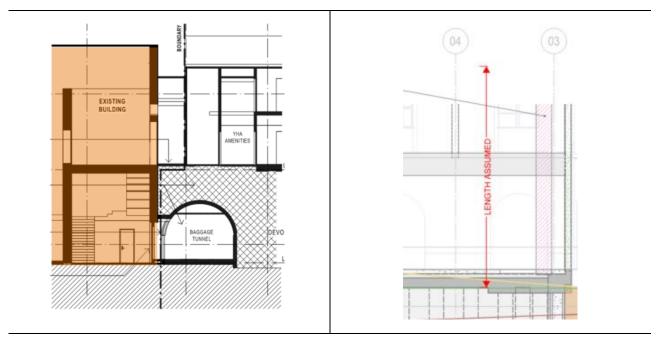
Cross-Section Elevation View of Central Building (BVN Dwg. AR-23D-GXX-03[2]) With Assumed Footing Depths for Characteristic Height
